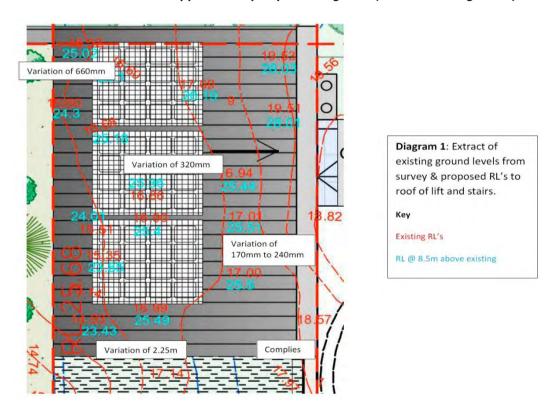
Plan of roof to lift and stair well showing existing ground levels (red) and proposed building height (blue) and maximum exceedence measures as "variation"
